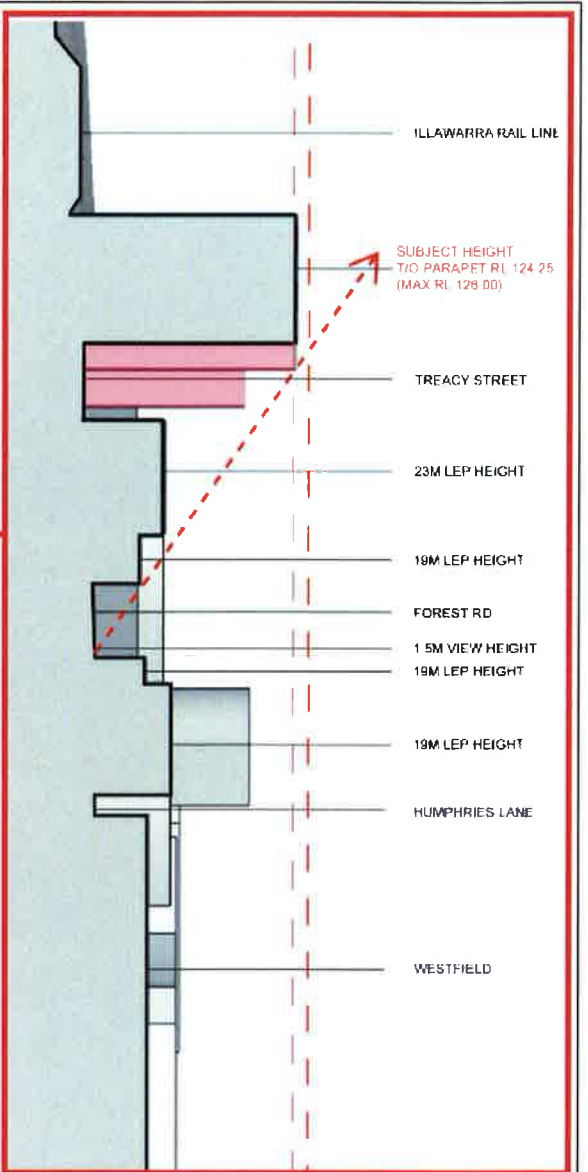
City Centre West-East Cross Section (Source: Proponent's PPR)
